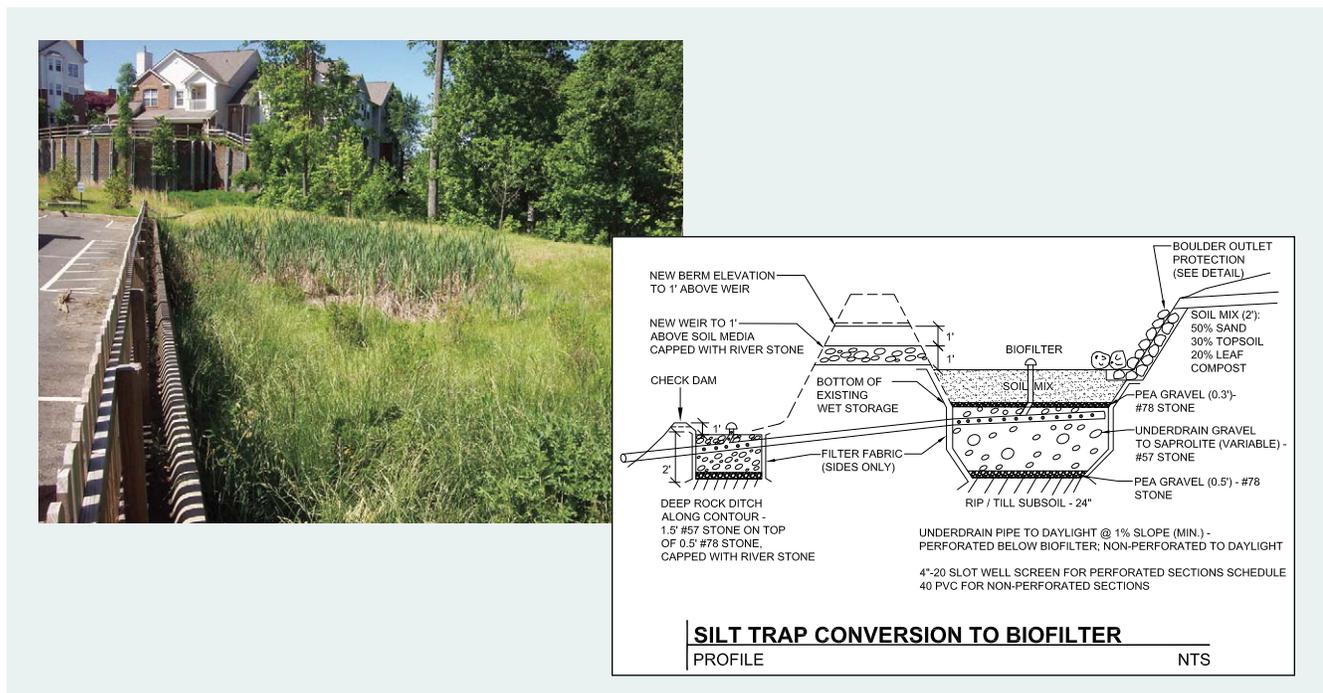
Construction inspectors should be involved in confirming as-built plans
